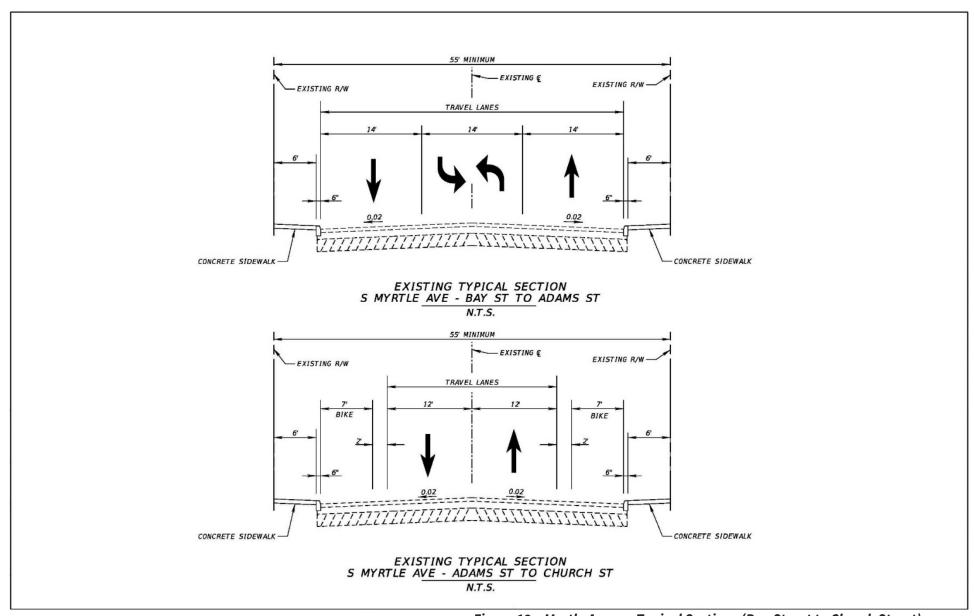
Myrtle Avenue Typical Sections (Bay Street to Church Street)
